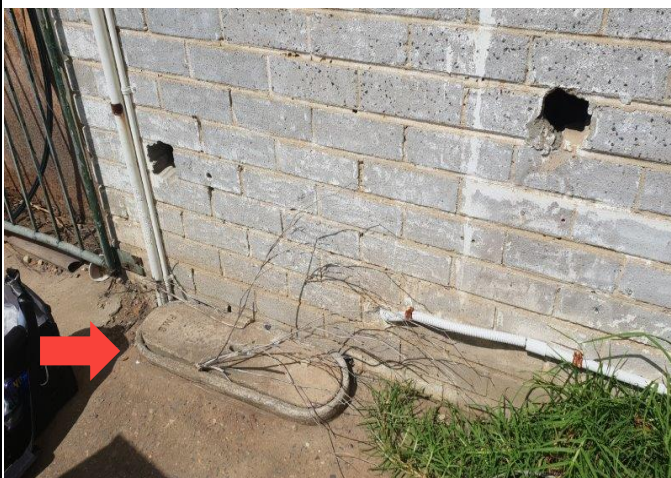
32-34 Good Street, ground floor, western aspect adjacent parking, asbestos-containing fibre cement mould of telecommunications pit
